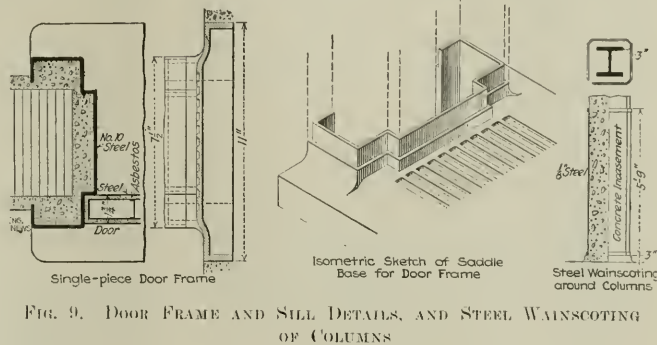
DOOR FRAME AND SILL DETAILS, AND STEEL WAINSCOTING OF COLUMNS
